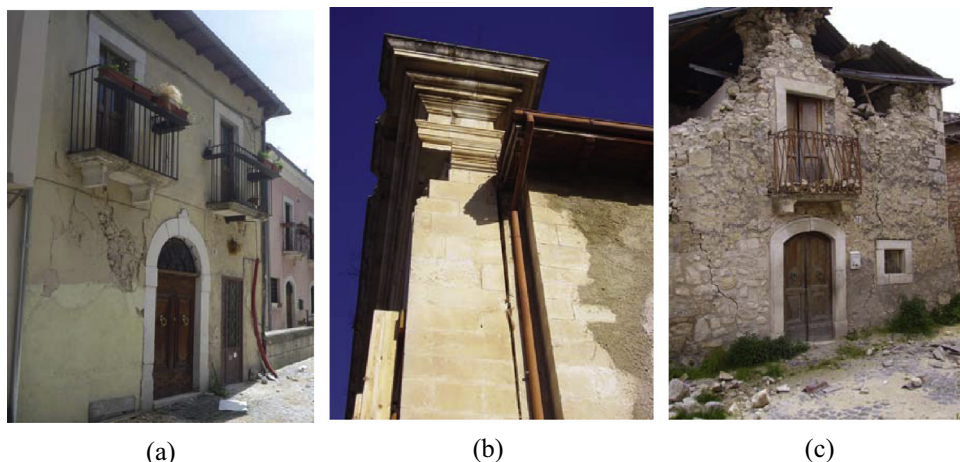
Main global collapse mechanisms: (a) in-plane, shear failures due to diagonal shear cracks in the masonry piers; (b) out-of-plane overturning; (c) diagonal wedge and horizontal bending.
